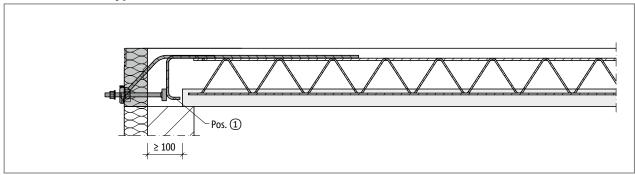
Schöck Isokorb® T type SQ: On-site reinforcement for semi-precast construction: Cross section
